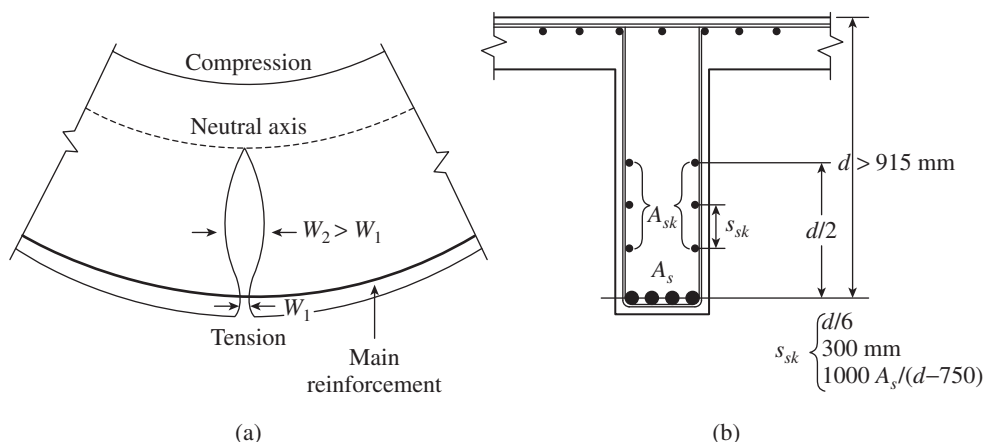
Side face reinforcement (a) Side face cracking (b) Crack control skin reinforcement for deep beams
